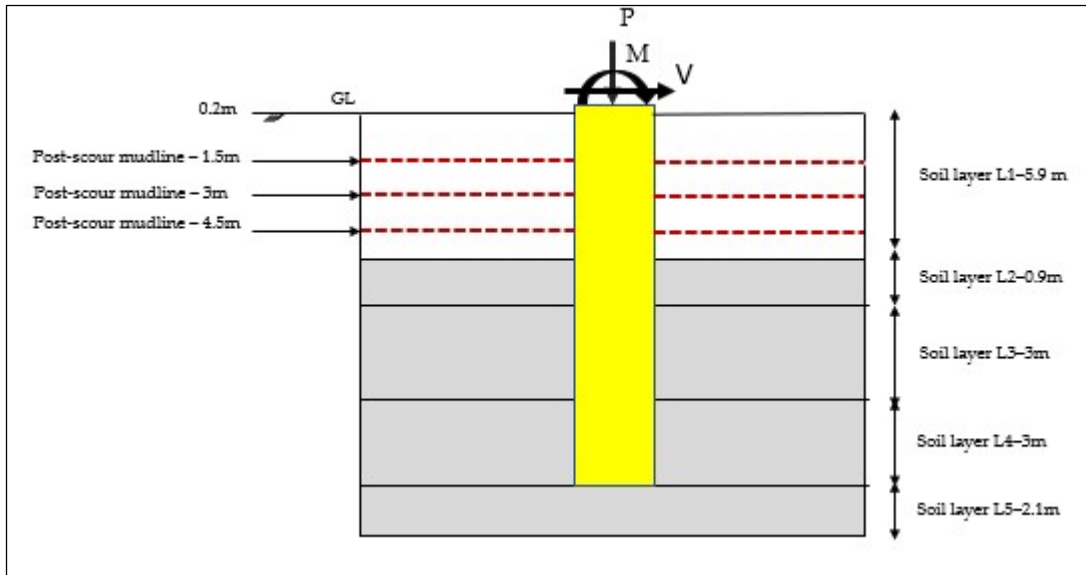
Schematics of soil layers and pier scouring at the Phillips Road bridge
